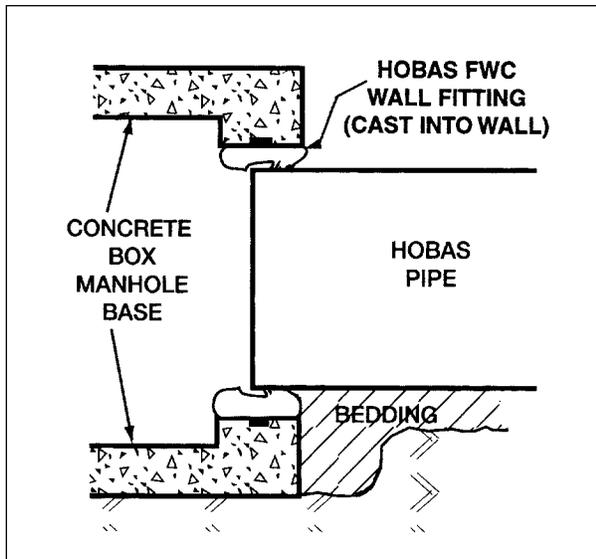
HOBAS FWC Wall Fitting Connection
